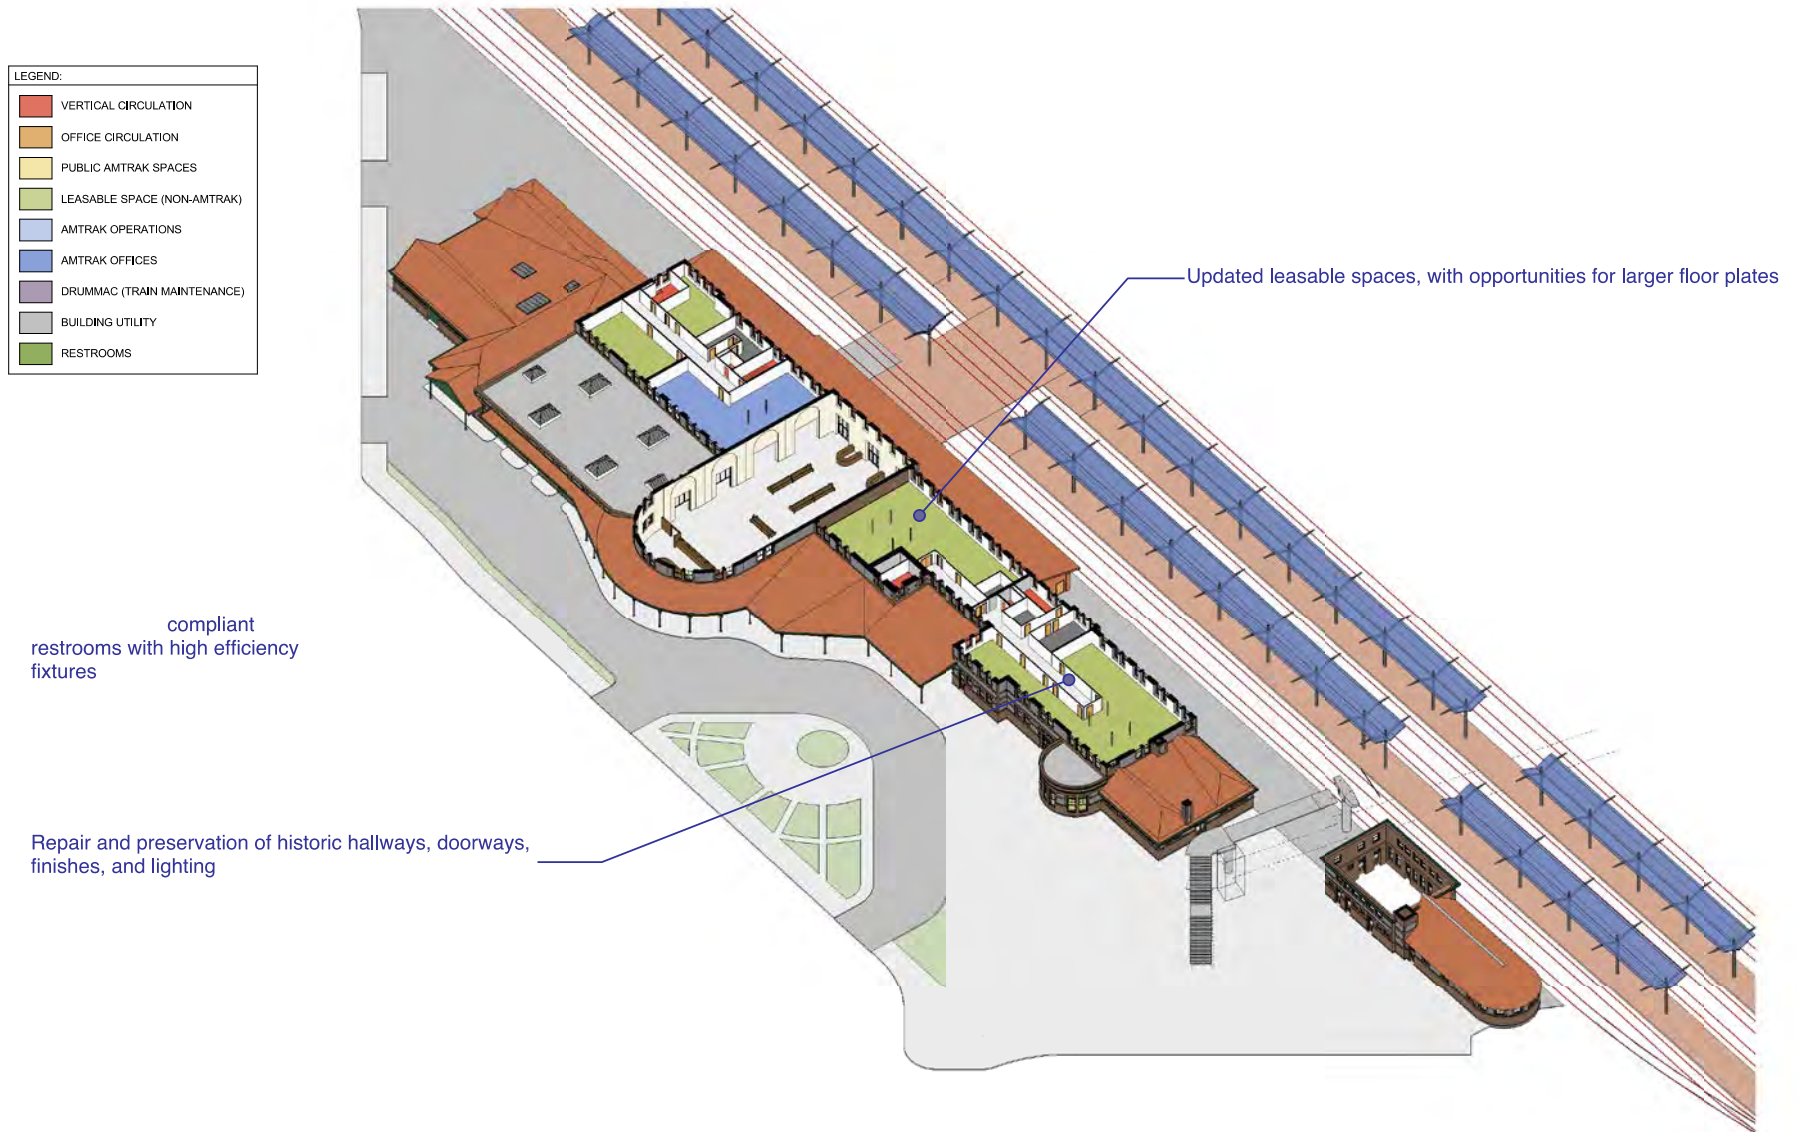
Proposed Conceptual Design Building Improvements - Third Floor
